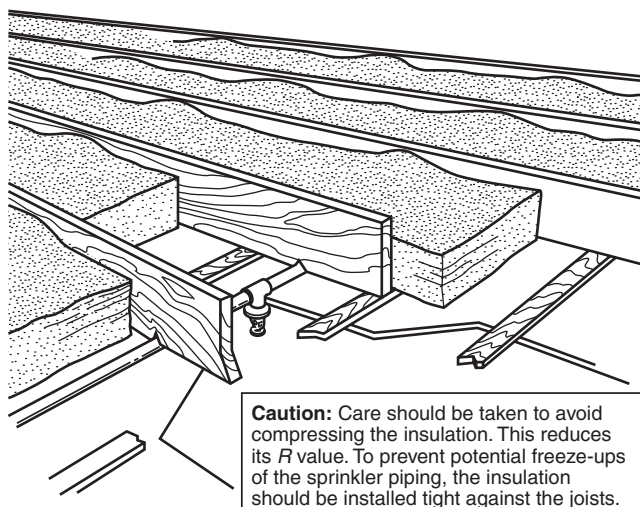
(d) Insulation Recommendations — Arrangement 4.
